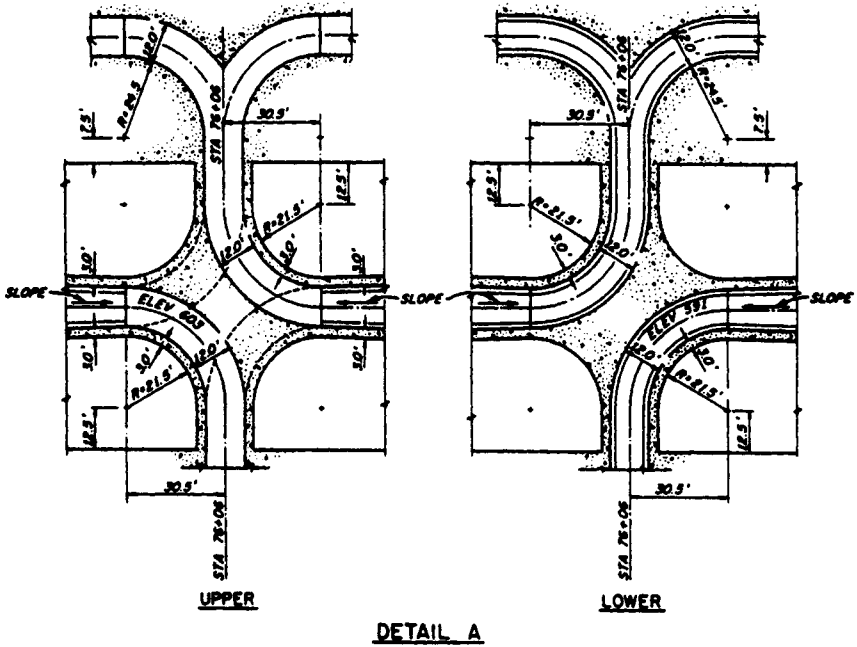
Balanced Flow Filling and Emptying, Over and Under Culverts with Two Distribution Culverts in Each End of Lock.
